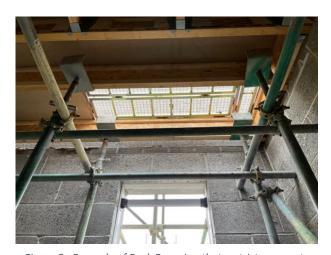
Example of Back Propping that restricts access to the upper floor due to poor planning.
